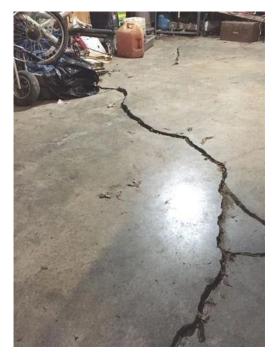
Damage on the pavement of a garage due to expansive soils. Source: Expansive soils (Property health inspection, 1999)
